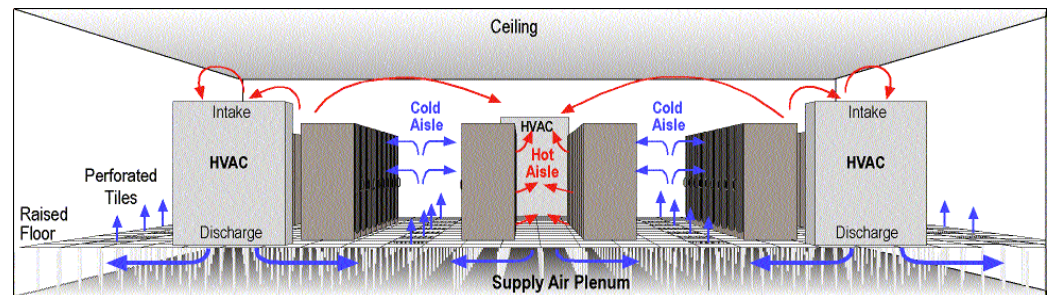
HVAC units should be placed perpendicular to rows of equipment.
